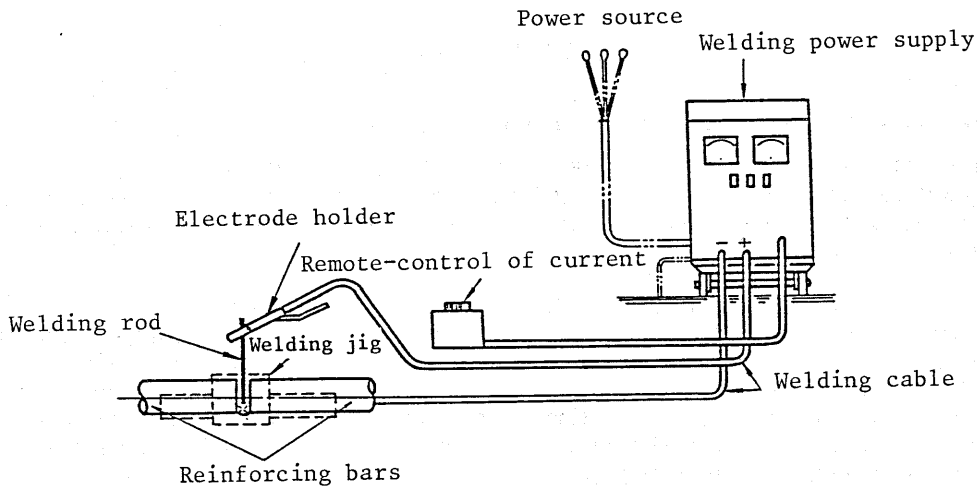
Example of manual enclosed arc welding equipment
